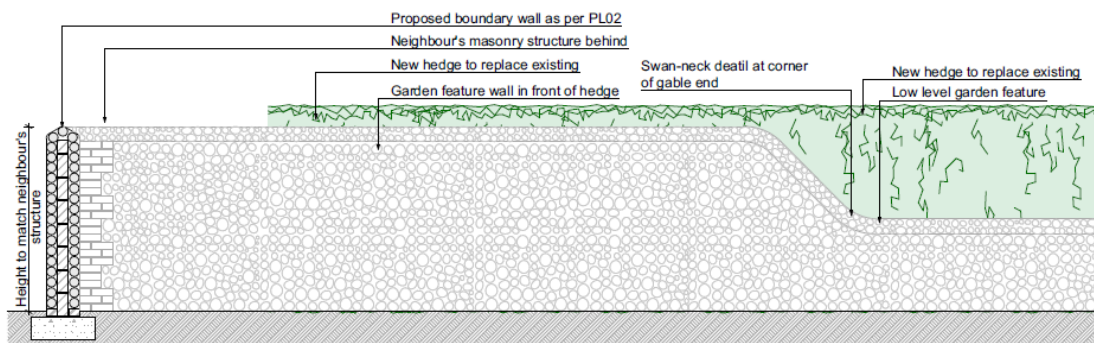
Proposed feature garden wall in front of replacement hedge – north elevation.
